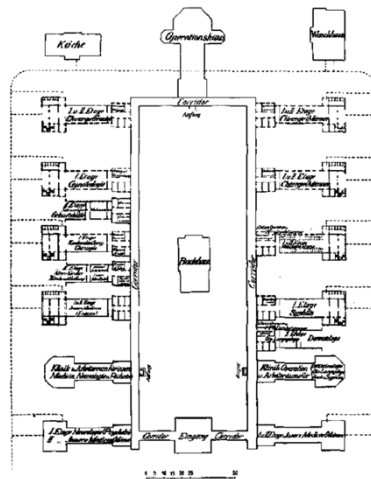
Haydarpaşa Mekteb-i Tıbbiye-i Şahane Building Plan (Yavuz, 1988)
